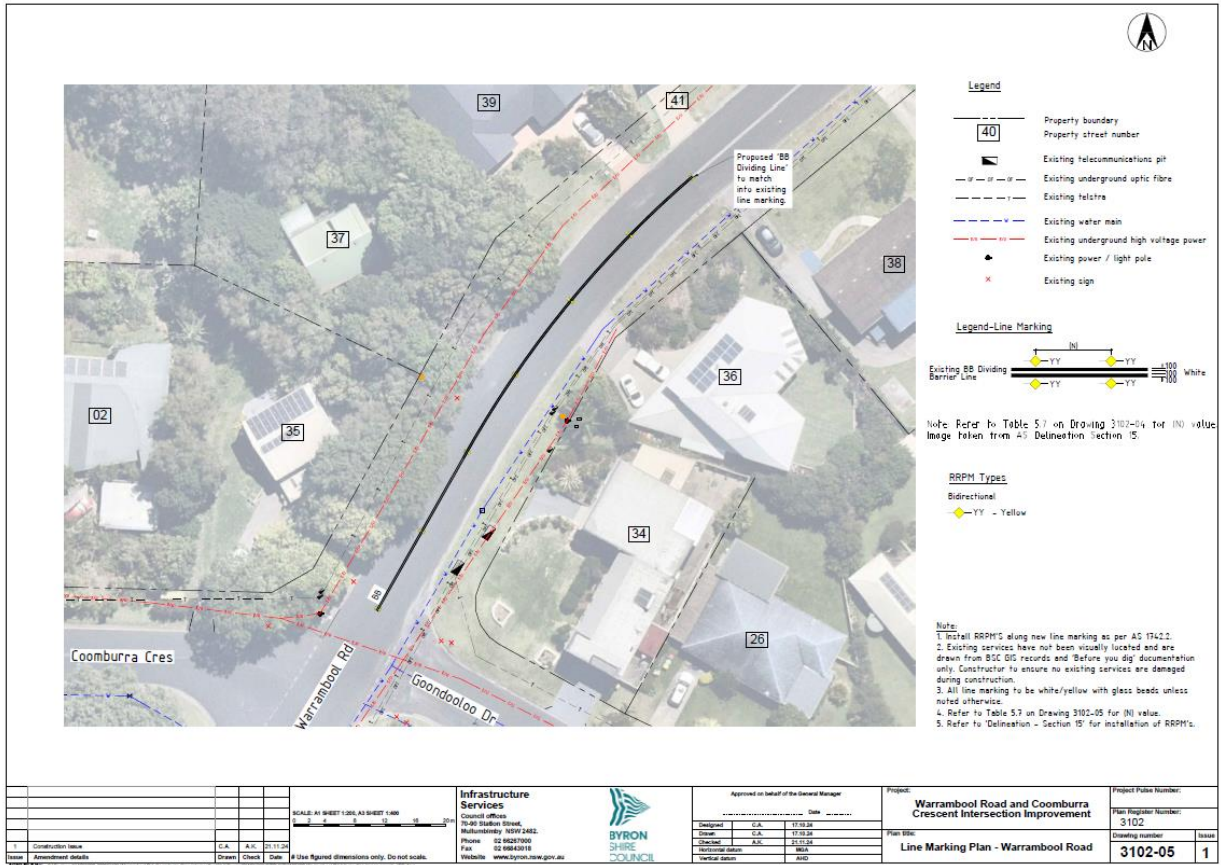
new proposed intersection layout (sheet 2 of 4)
